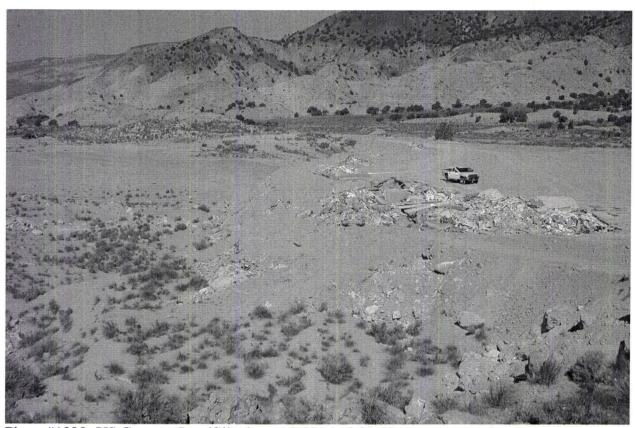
US Gypsum Landfill taken at 9:03 am 5-20-03 Photo shows working face with cover soil applied
